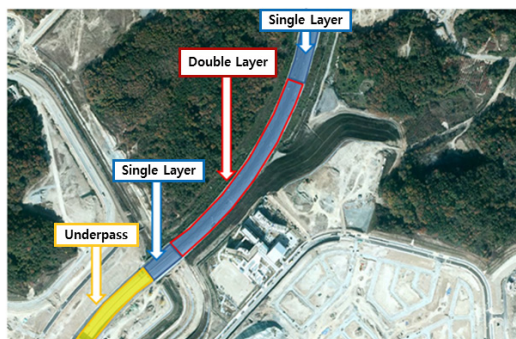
Status of Double and Single-layered porous pavement in Sejong City
